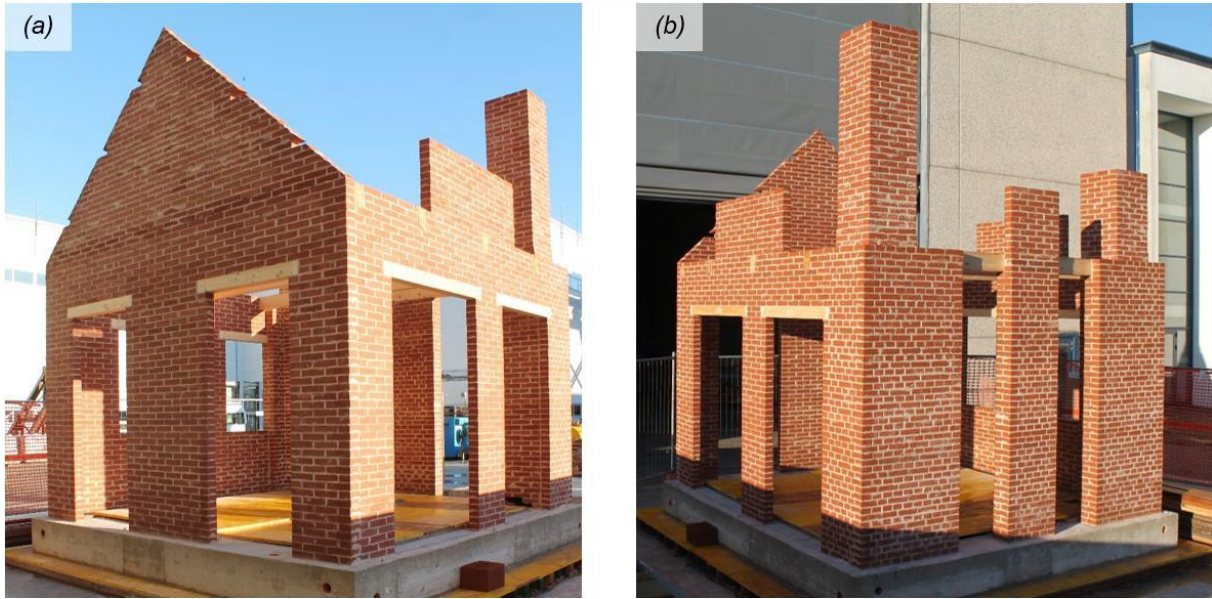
Full-scale building prototype: (a) North-West view; (b) South-West view [4, p. 5]
